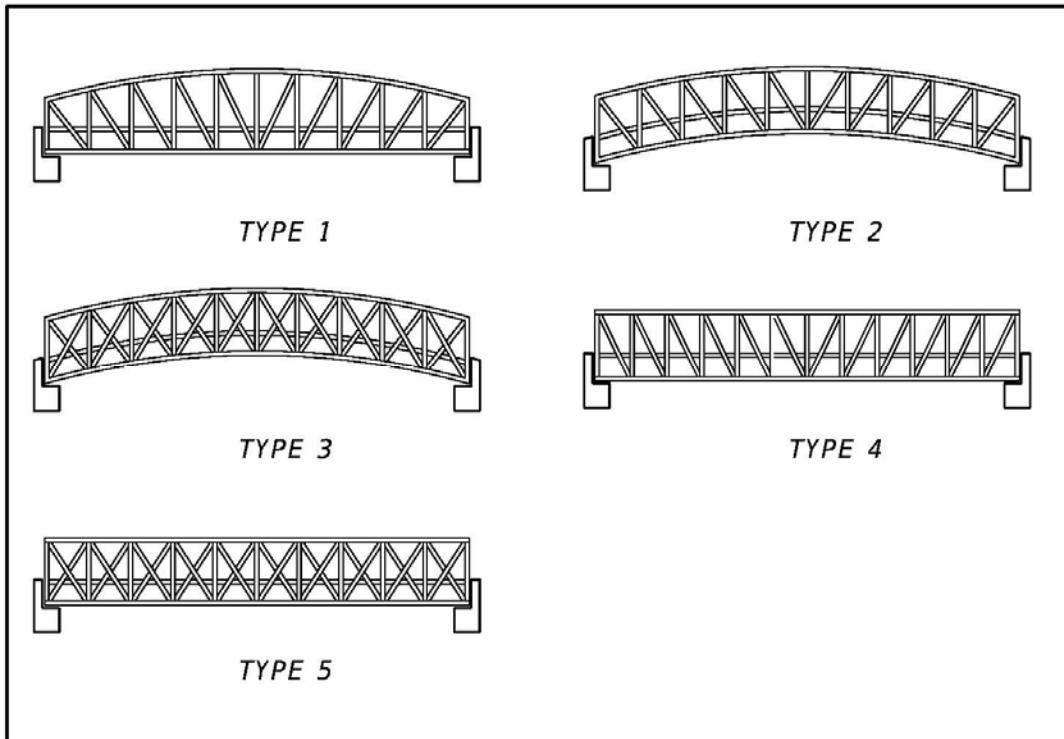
Prefabricated Pedestrian Bridge Standard Truss Member Shapes
